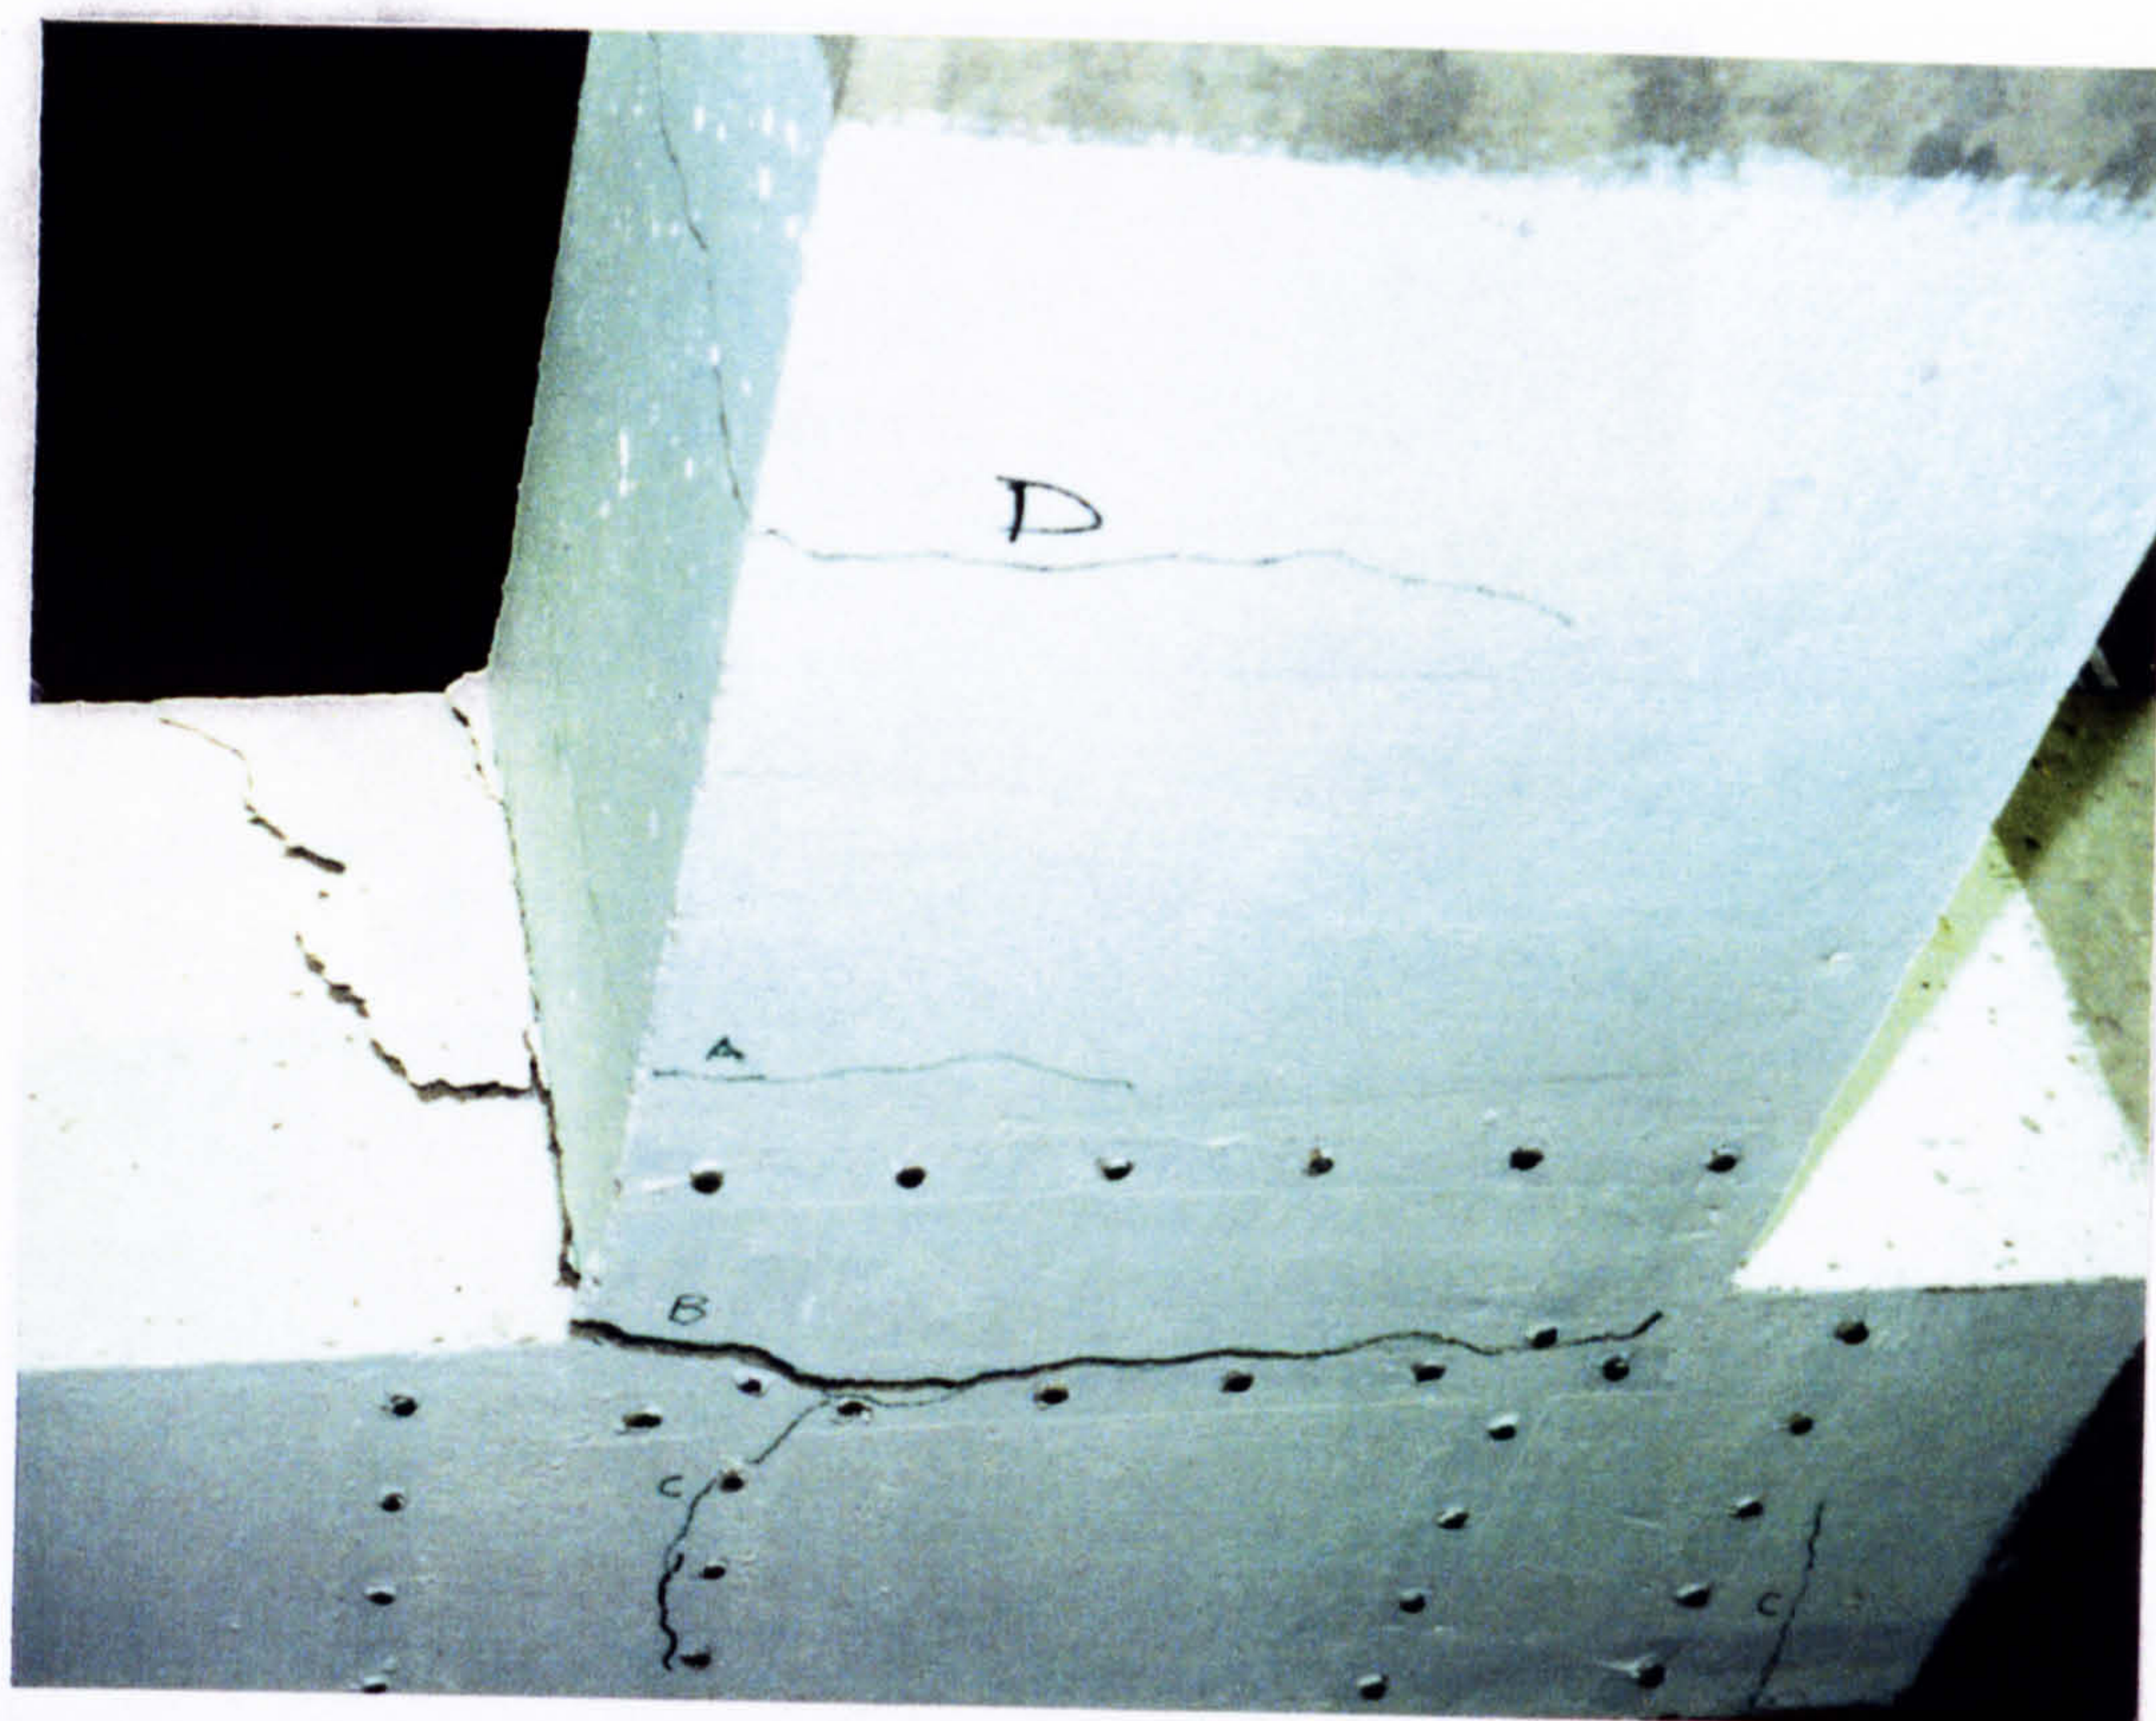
U-STIRRUPS OVERLAPPING & CRACKING PATTERN - UD1 -
